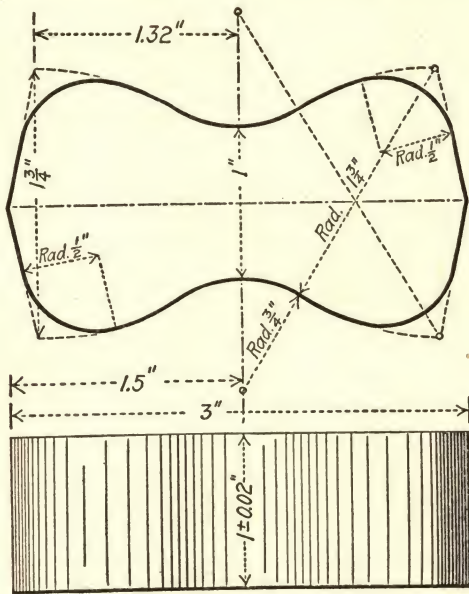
Diagram Showing Form and Dimensions of Standard Cement Briquet Used for Testing
